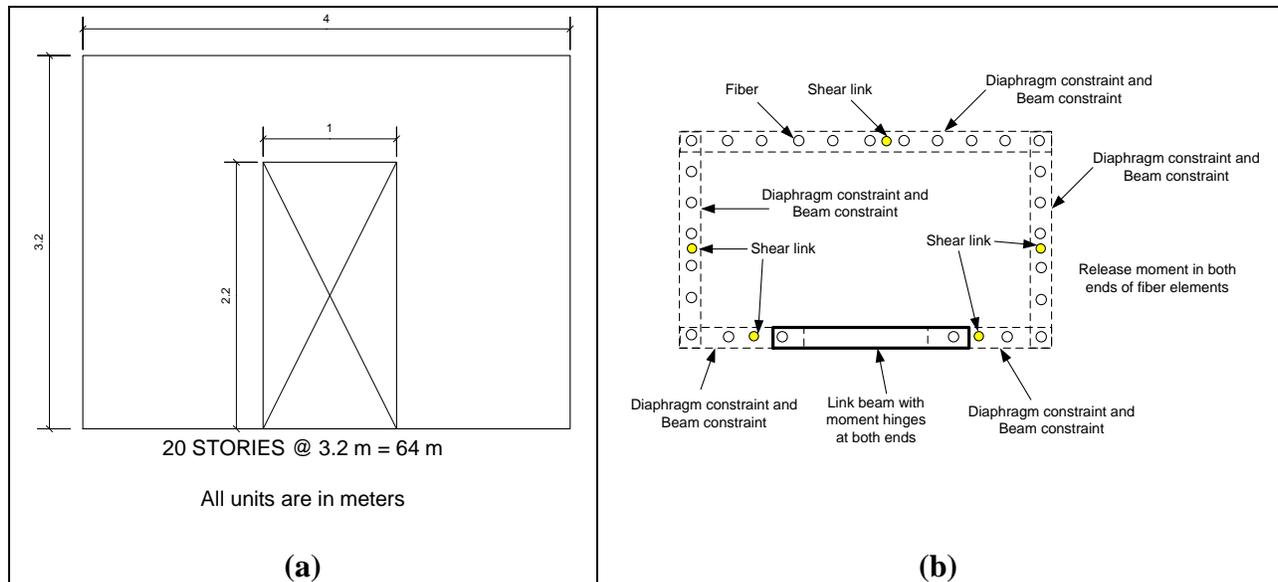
(a) Elevation of opening in core wall; (b) Fiber or frame modeling in core wall
